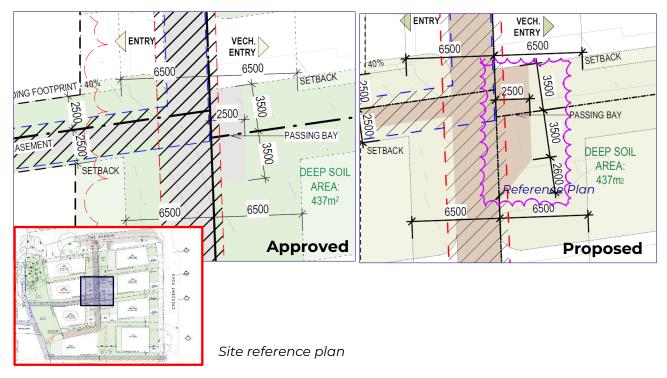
Architectural Envelope Plan – Proposed Passing Bay AmendmentsSource: Scott Carver + Ethos Urban
